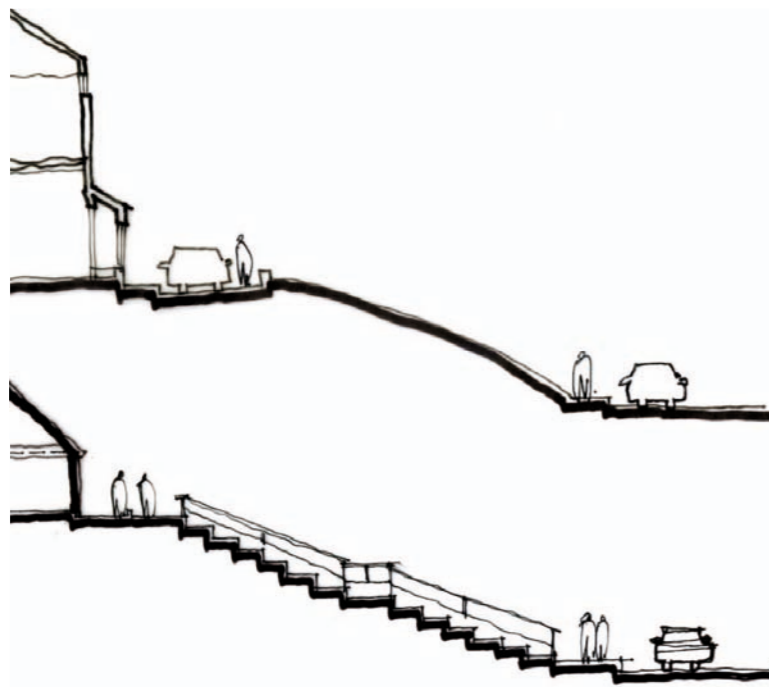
Indicative sections demonstrating the elevated position of the residential dwelling with respect to the road. In the first section, a secondary lane provides vehicular access to the house
